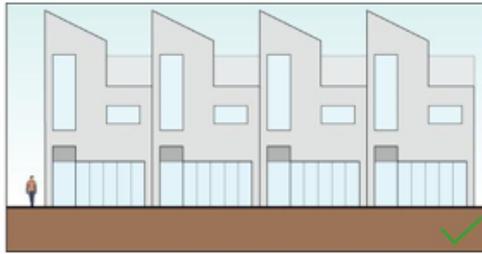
Designing the ground and upper floor uses as an integrated building
